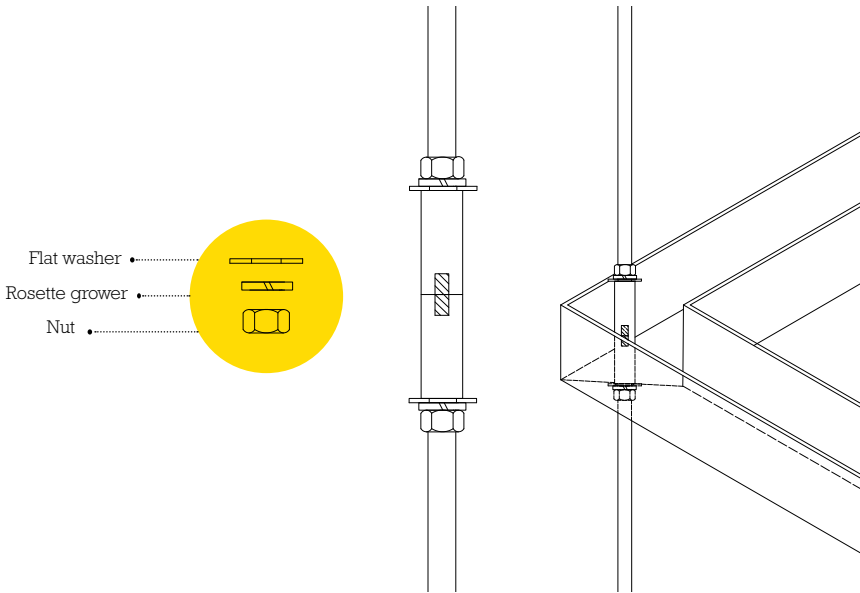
Construction detail - Joints and components of the tie rods | Axonometric and elevation views.
